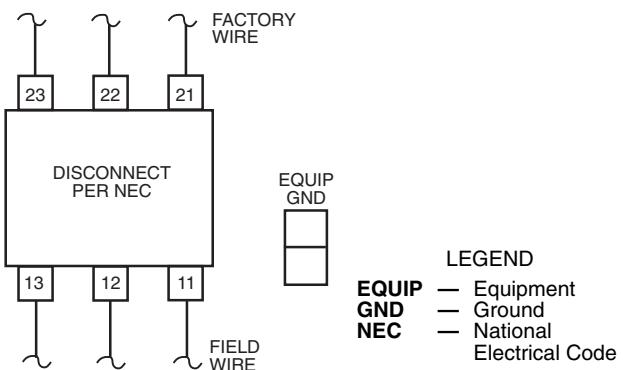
Field Power Wiring Connections for Factory-Installed Disconnect
